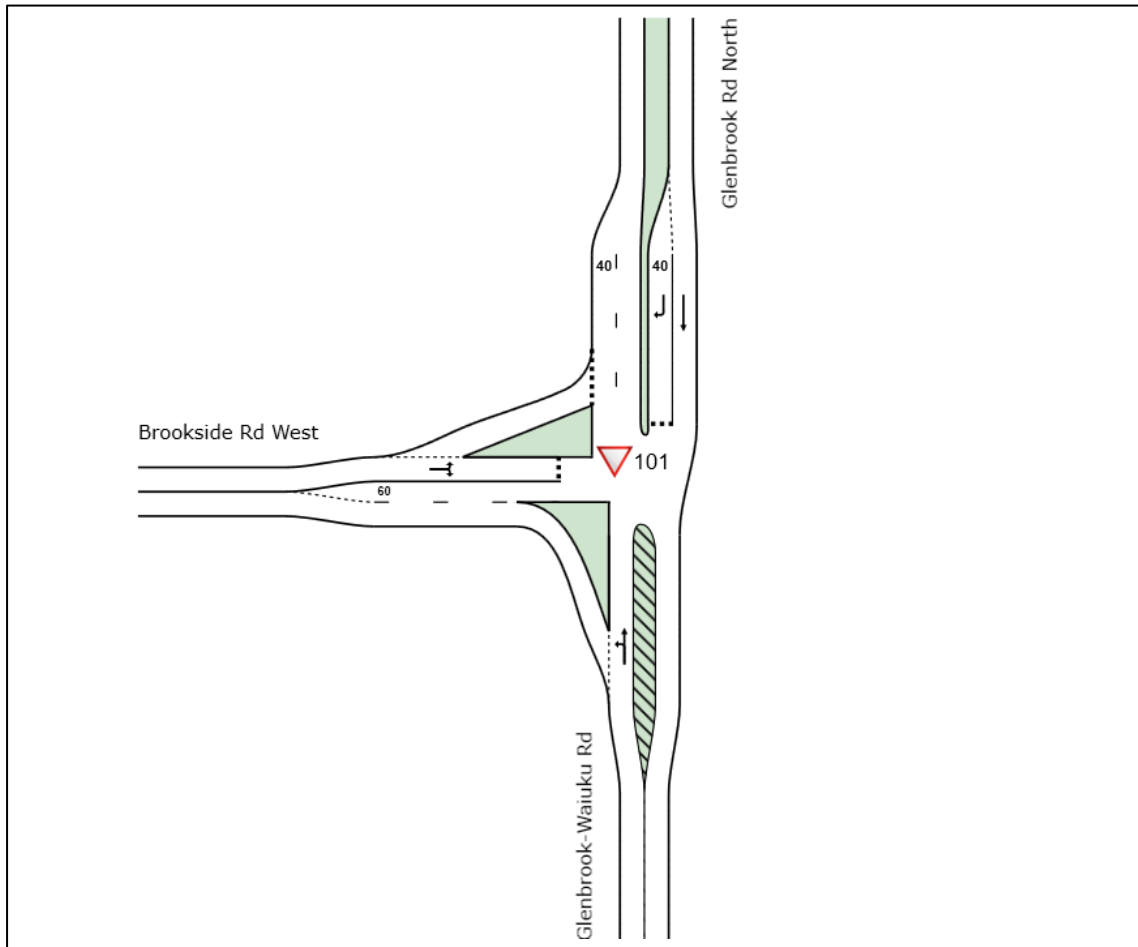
Glenbrook Road / Brookside Road Modelling Layout
